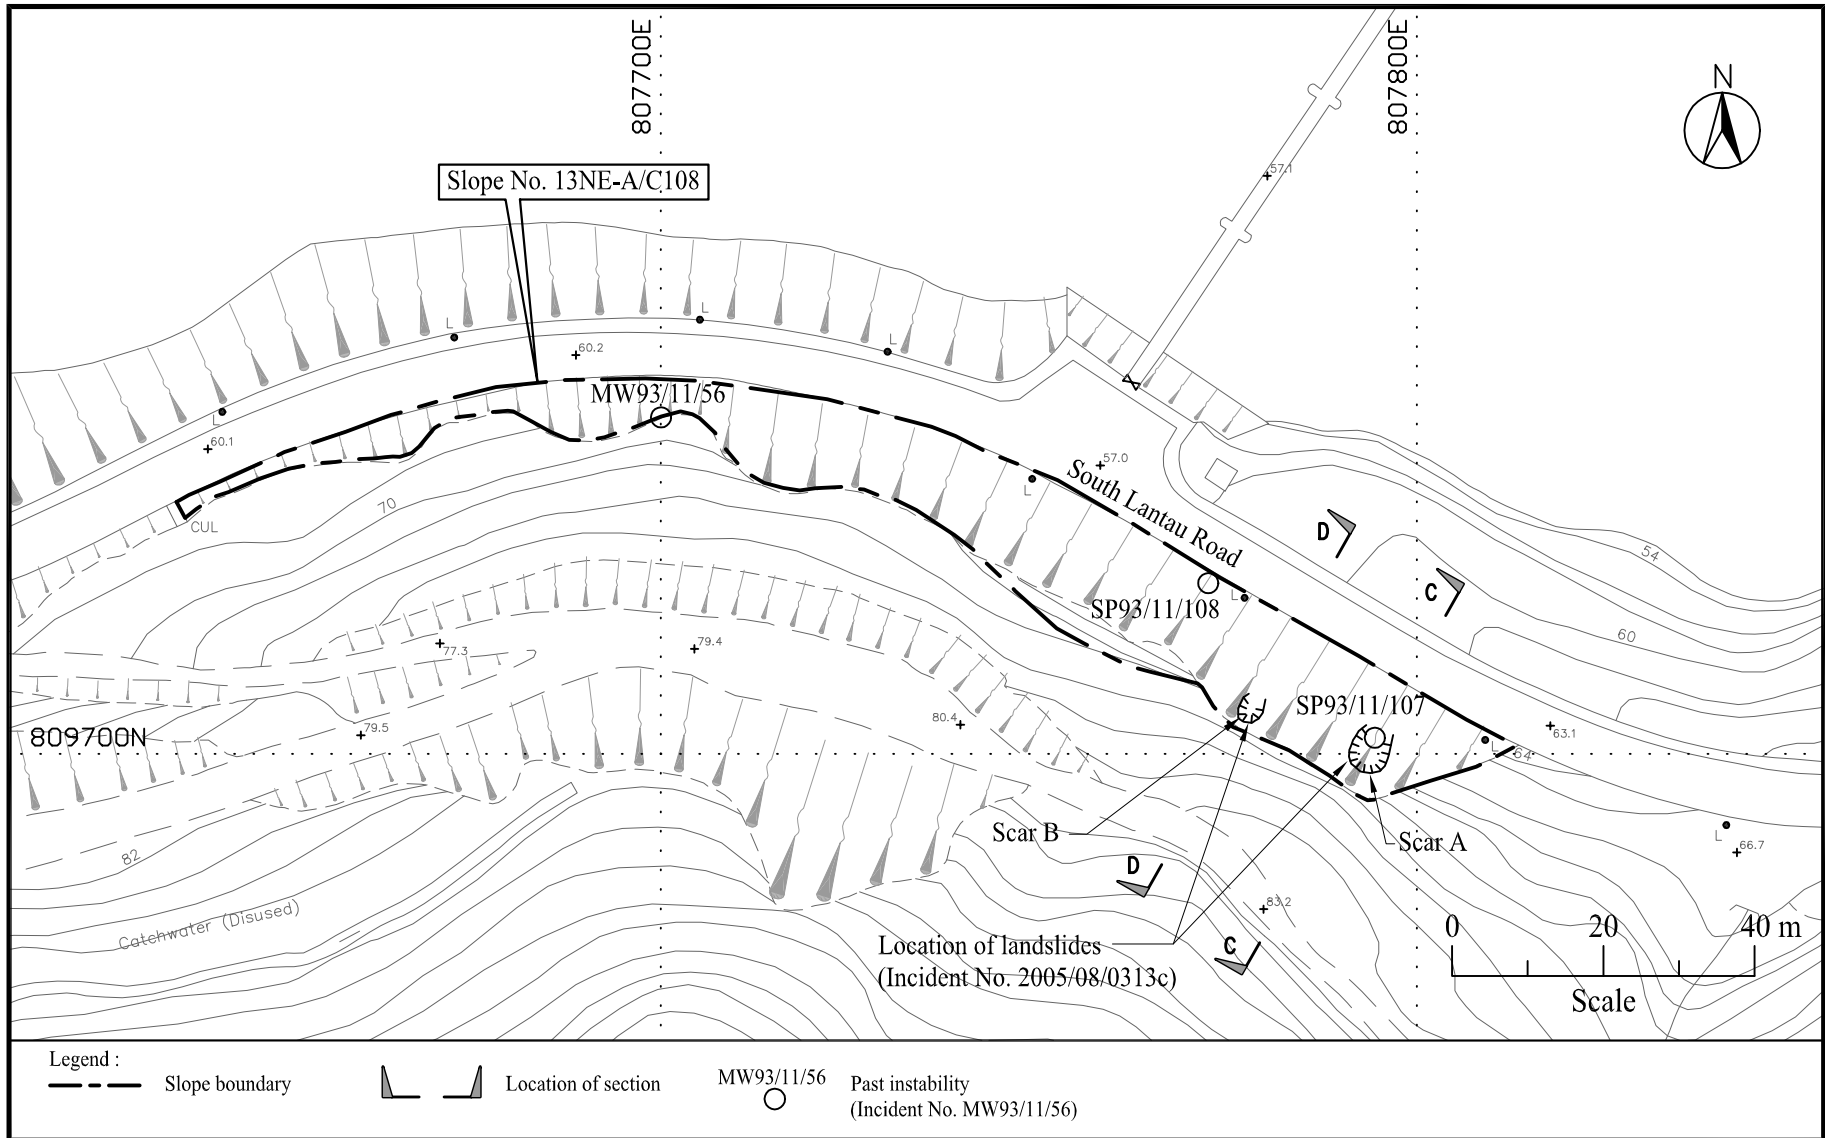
Site Plan (Slope No. 13NE-A/C108)
